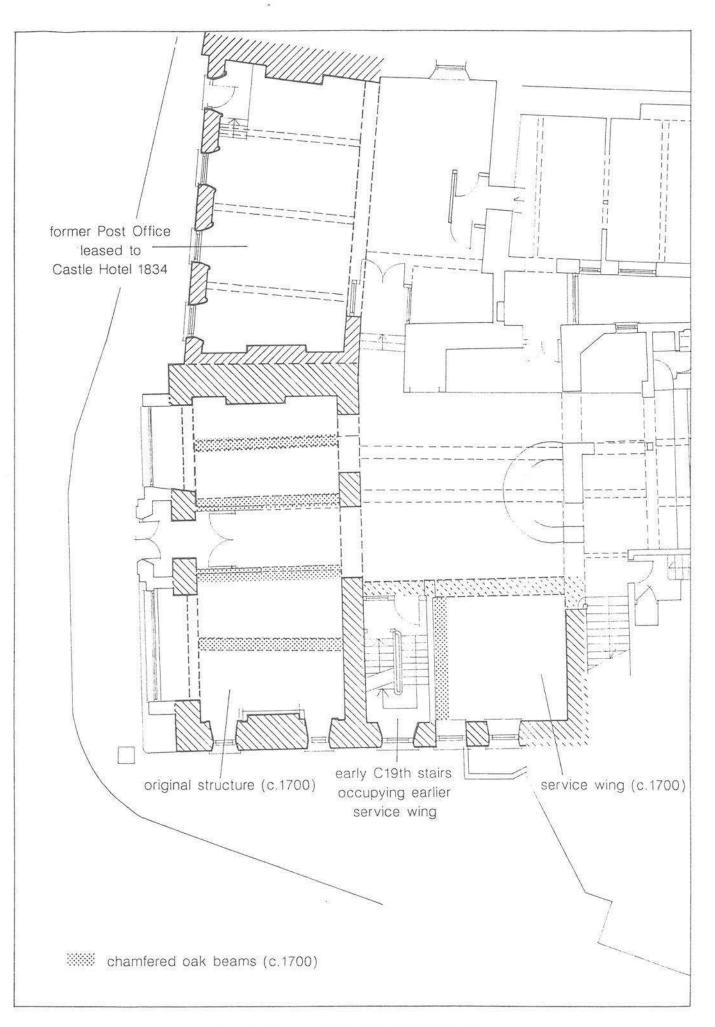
Plan of part of Castle Hotel site. (Taken from plan provided - scale 1:200)
